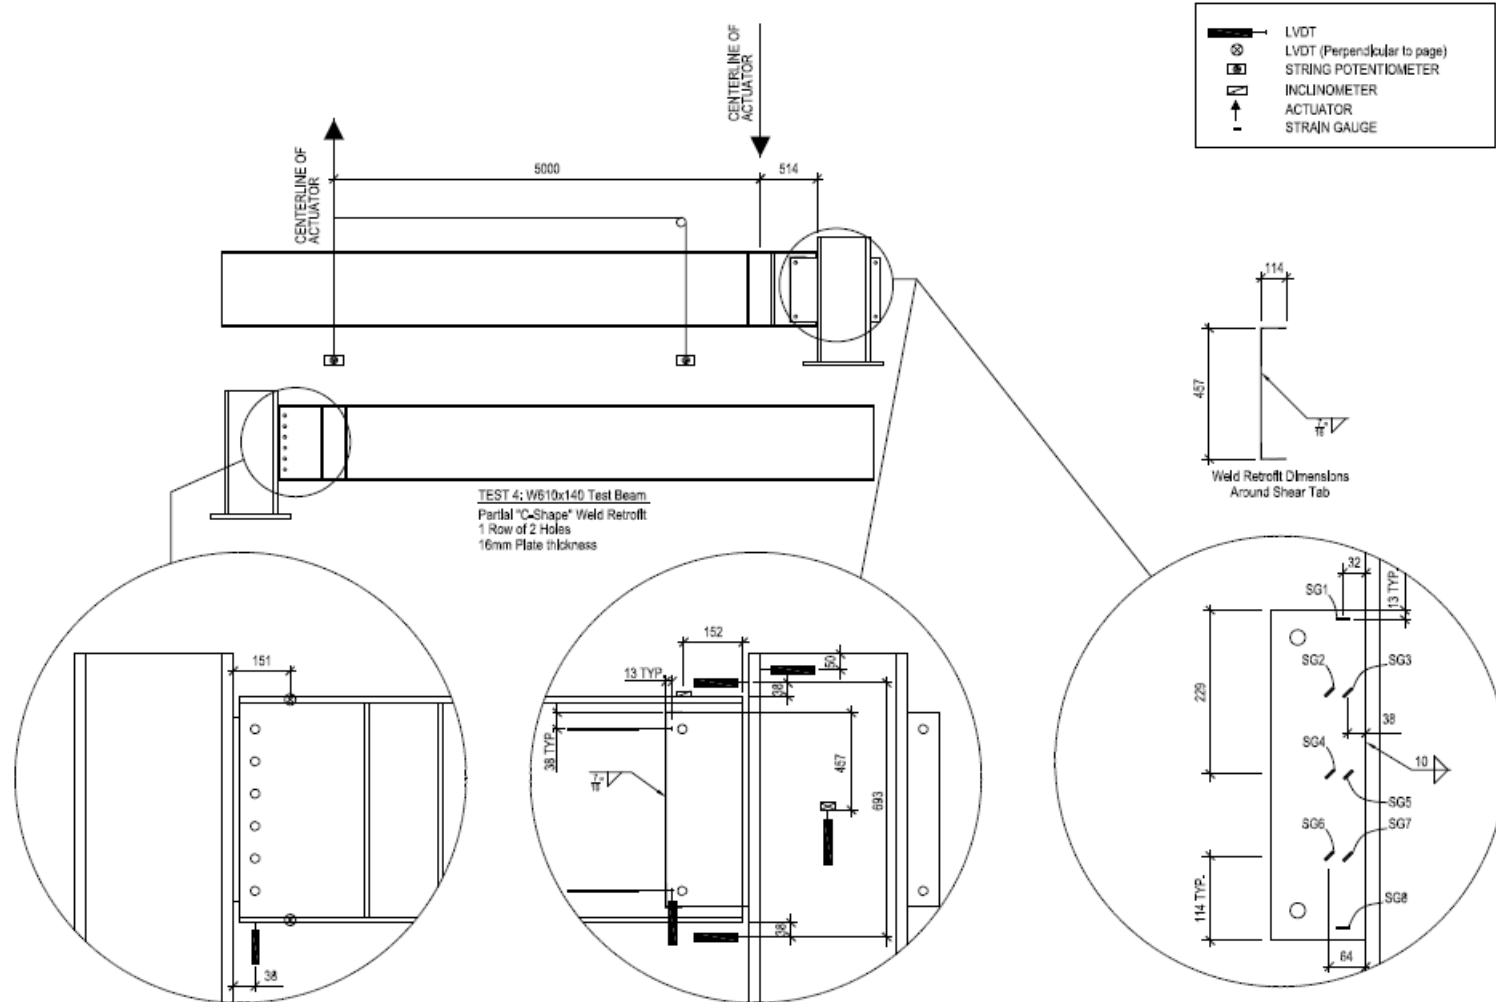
Typical Setup Instrumentation for Welded Setup for a W610 Beam – Test 4
